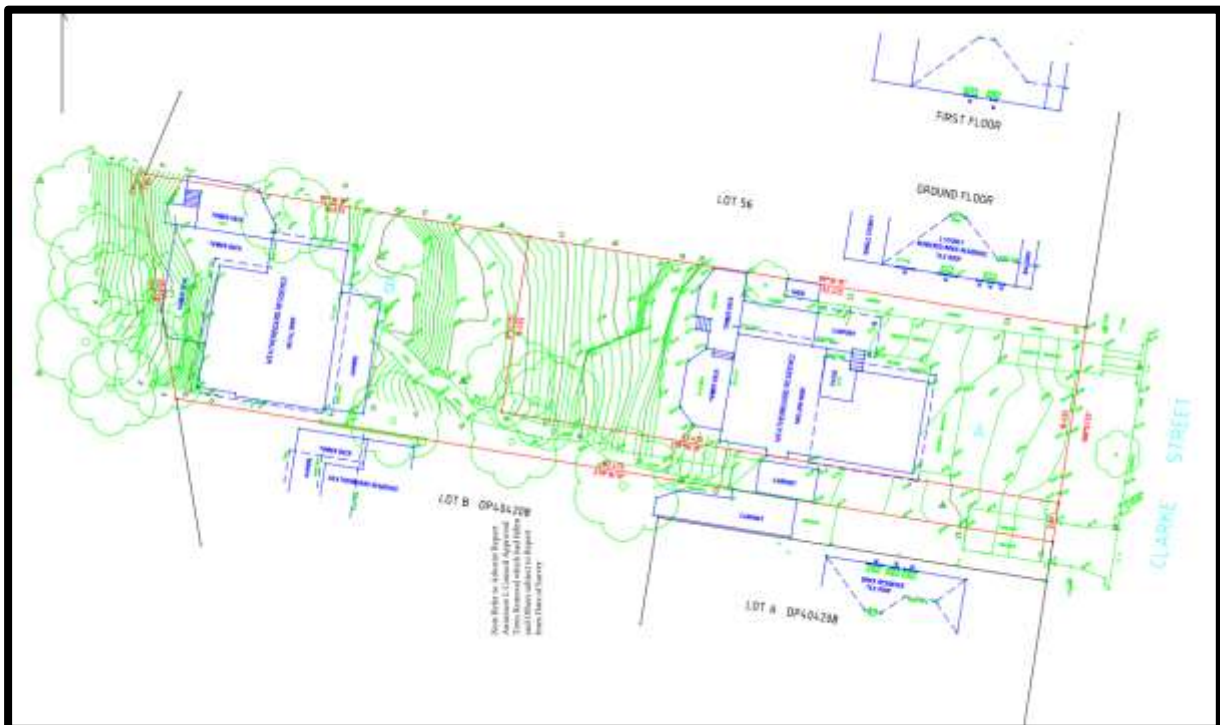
Site plan (57-59 Clarke Street, Peakhurst) (Source: Bodesign, 18)
